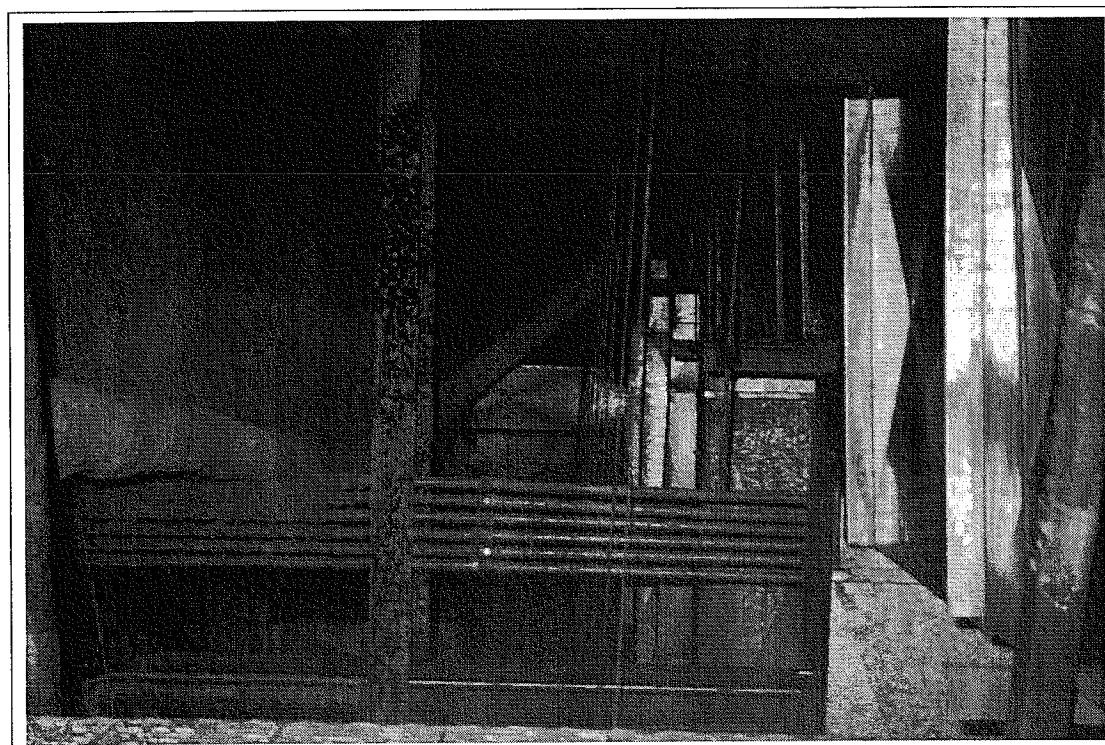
General view of fireproofing 5<sup>th</sup> floor attic
